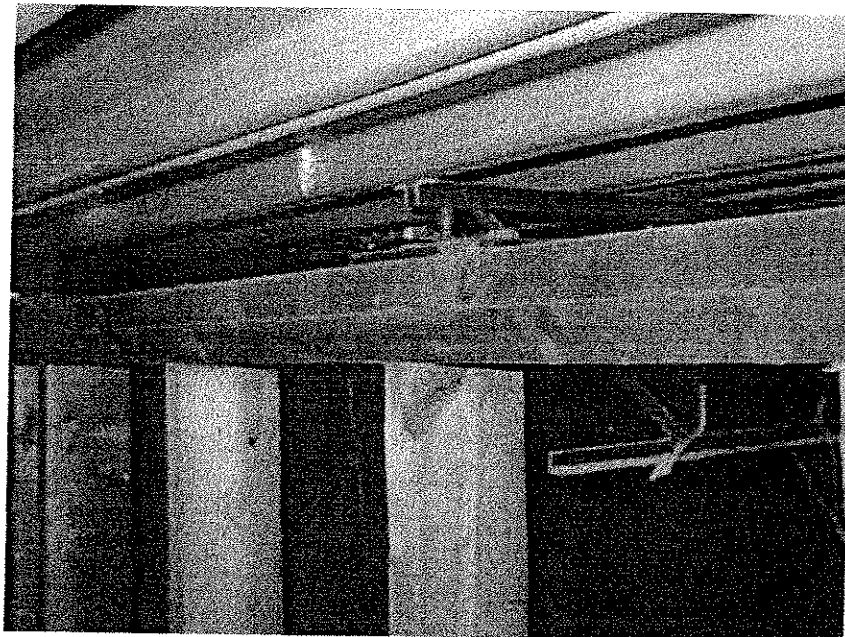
Typical Joist Shoe Connection to Wood Bearing Wall
